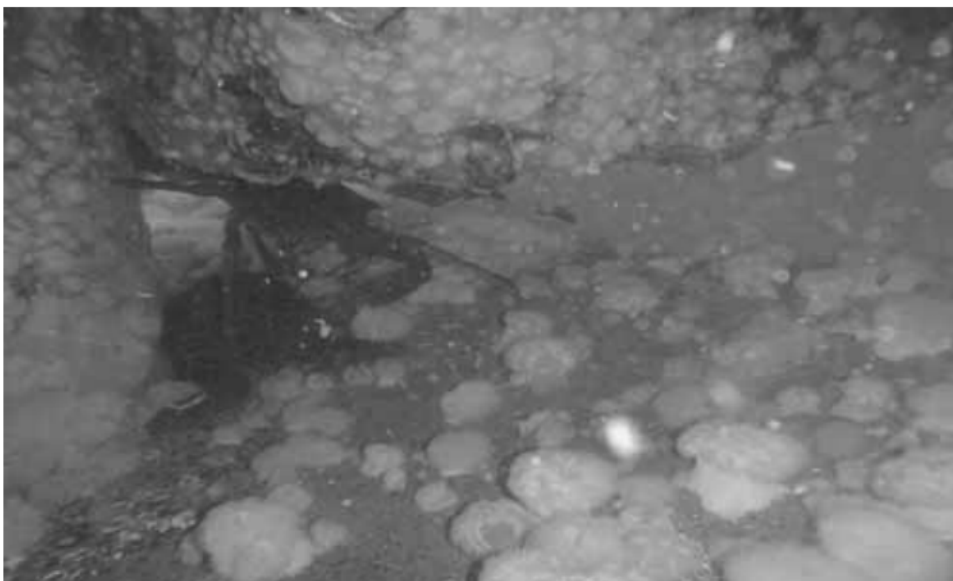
Canal Bridge No. 6880 - Pile No. 8.1 on Pier No. 8 is not in bearing.
